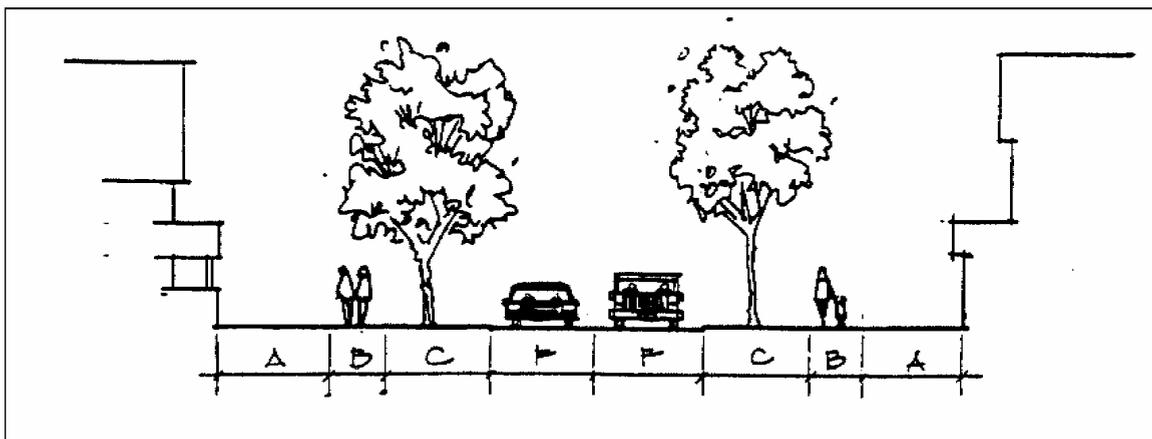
Schematic sketch of a typical local street cross-section. Table 1 lists the recommended dimensions of each component: A) building setback from street right-of-way; B) walkway; C) planting area; F) travel lane.
